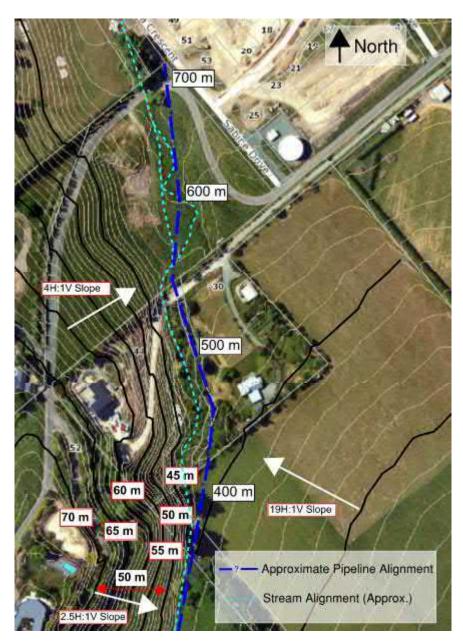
Approximate Richmond South Pipe Alignment (Northern Section).
